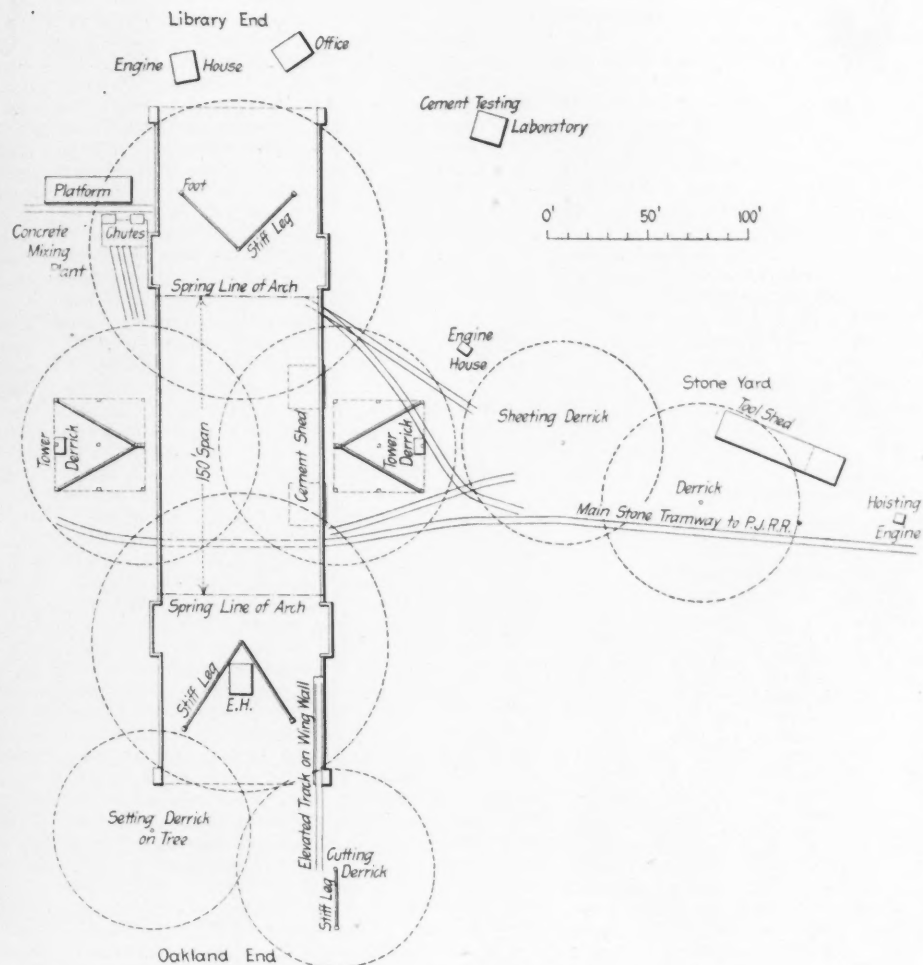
PLAN OF DERRICKS AND TRACKS FOR HANDLING MATERIAL.
